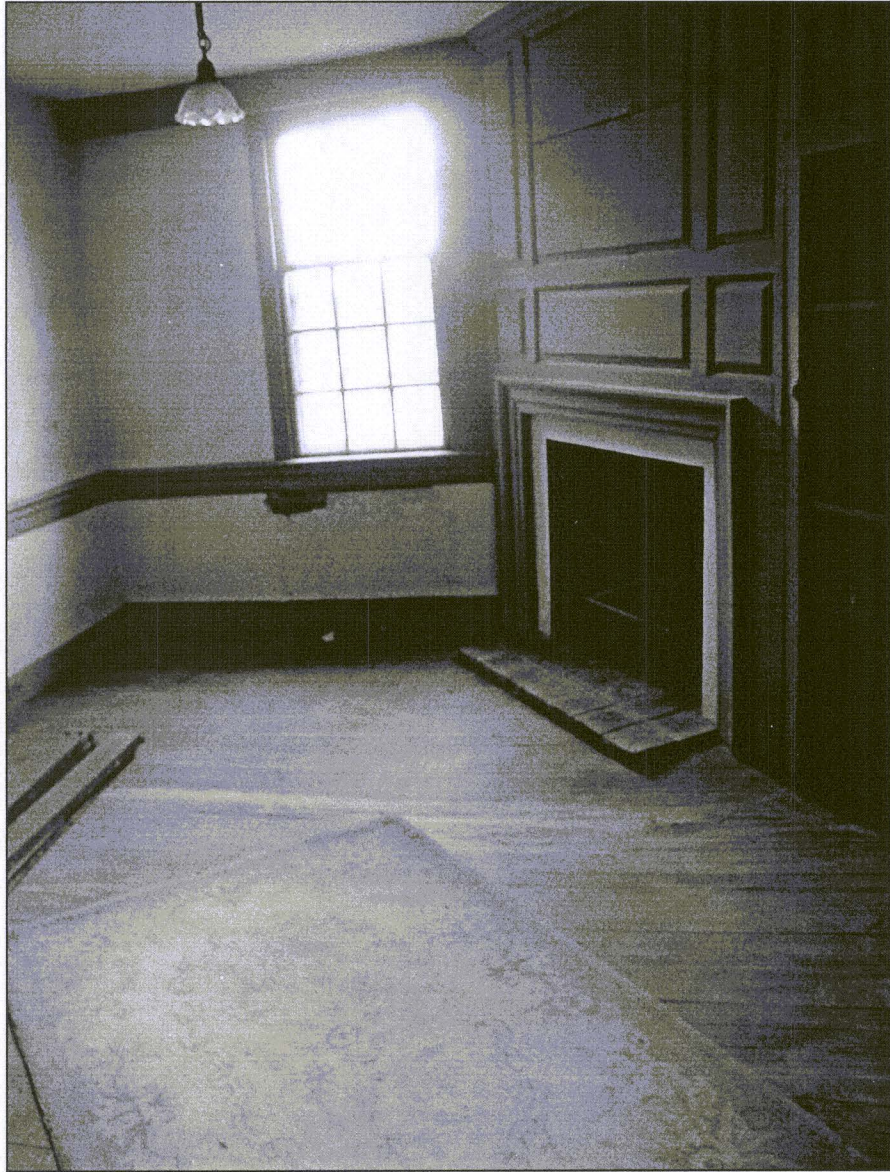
Period 1, second floor. Note water damage to window sill and floor.
